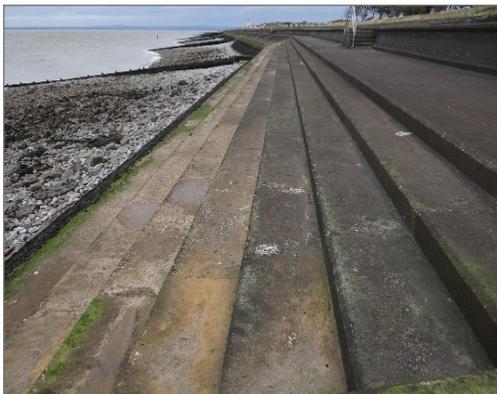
Stepped concrete revetment with sheet piled toe, rear wave return wall and timber groynes between Solway Lido and Eastcote. Photograph taken during CEUK asset inspection (March 2016).
